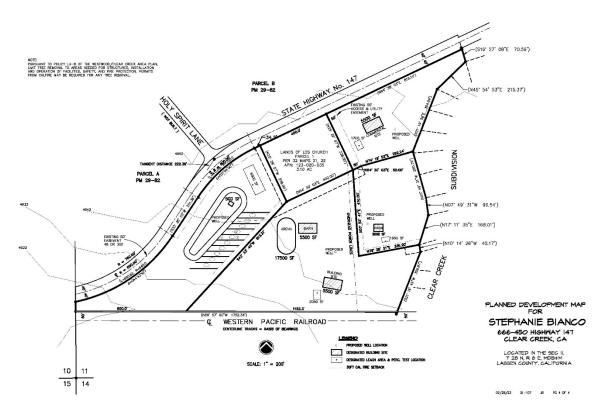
Existing Parcels, Proposed Parcels, Proposed Plot Plan
